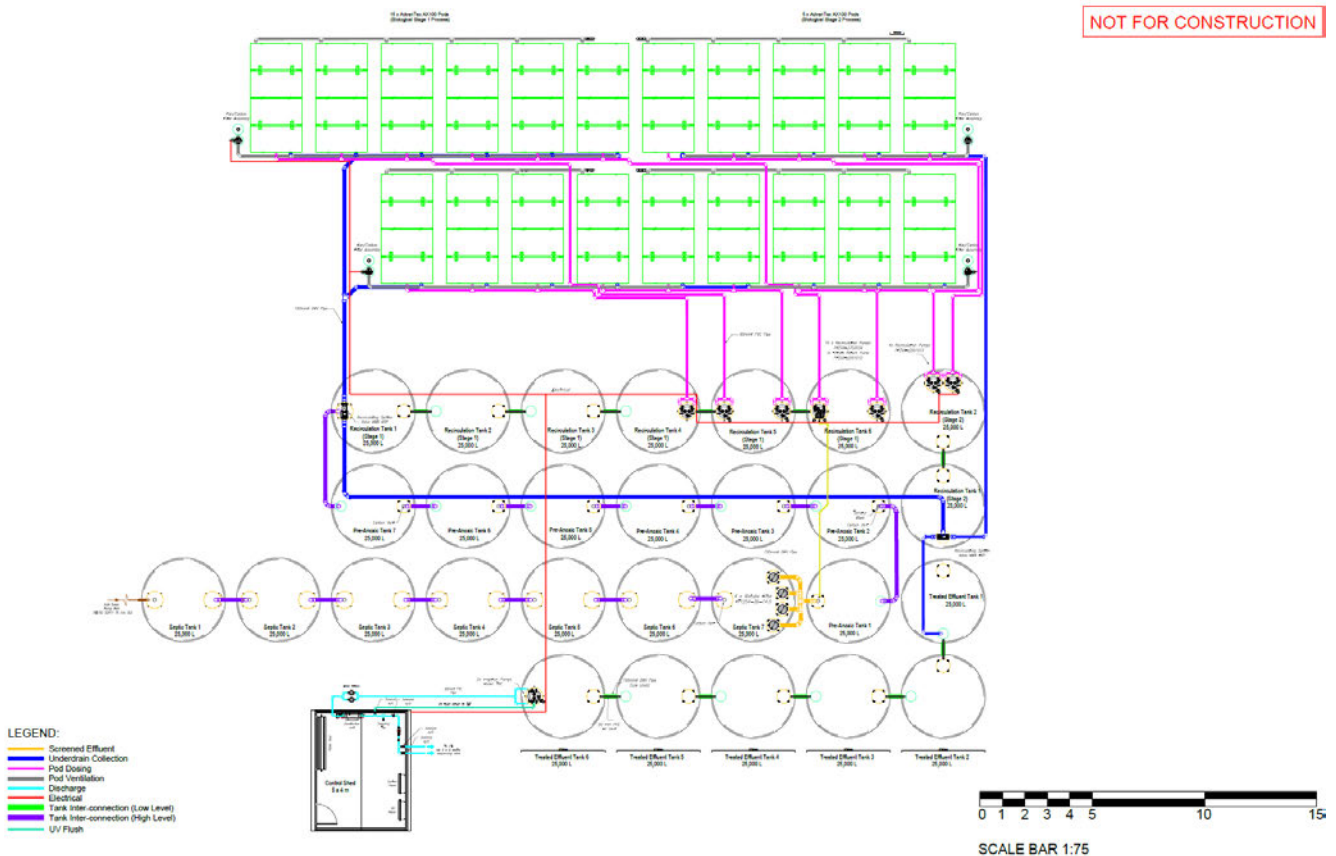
Snapshot of Proposed Wastewater Treatment Plant
